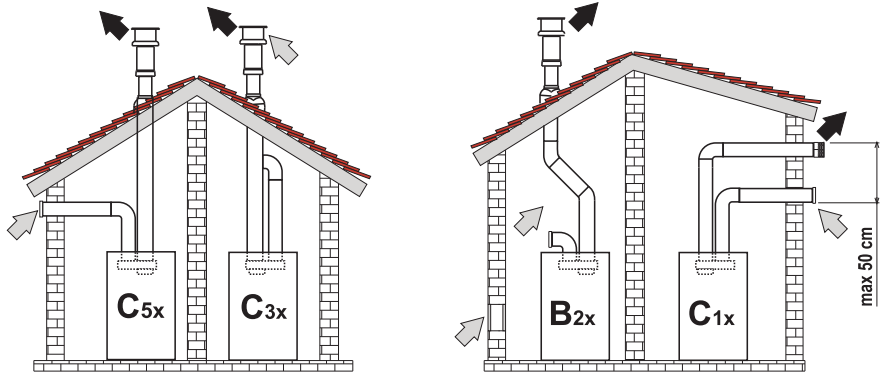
Examples of connection with separate pipes ( = Air / = Fumes)
